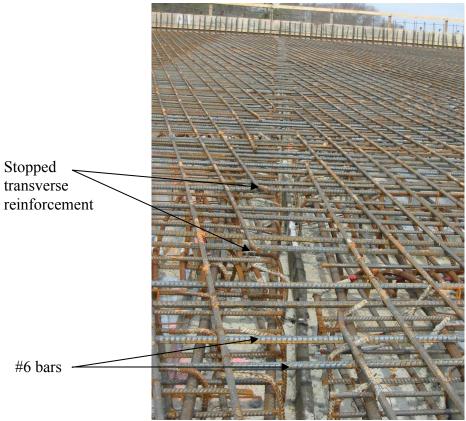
Skewed continuous deck bridge construction (bridge supporting US 27 at SR-1, Cedartown Bypass)
